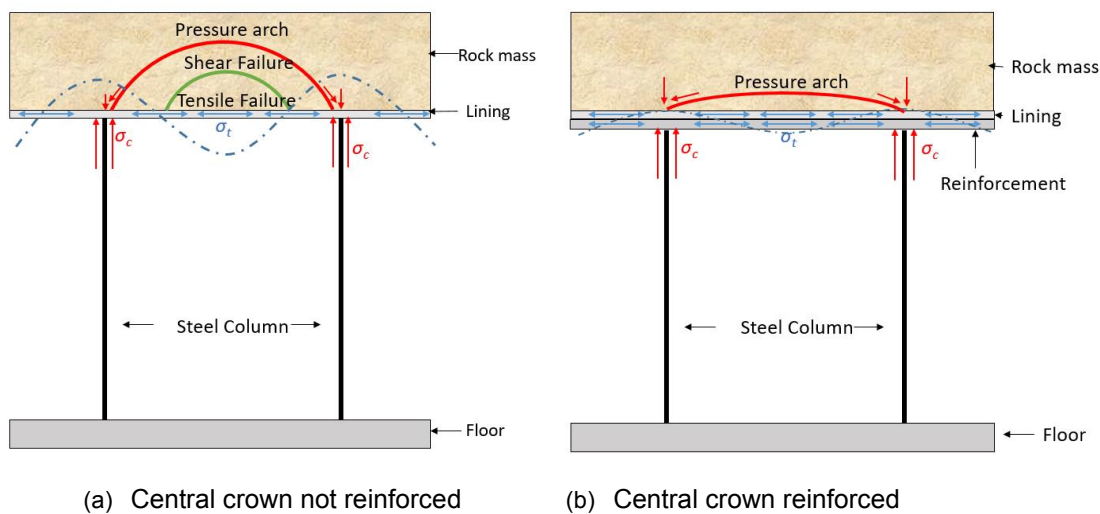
Illustration of load transferring mechanism between lining above columns and steel columns
